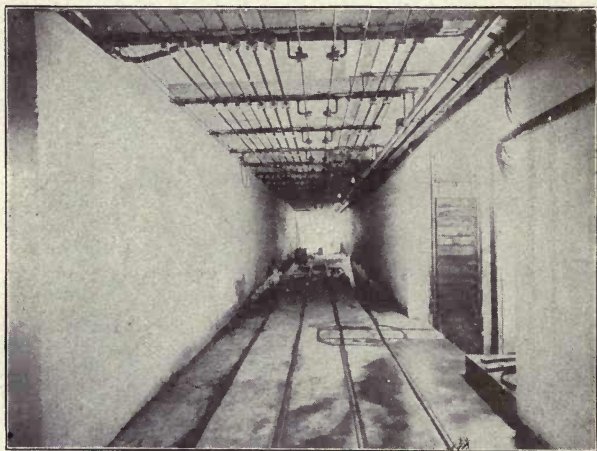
TUNNEL TRAVERSING PROPERTY OF WAGNER ELECTRIC MANUFACTURING COMPANY.
